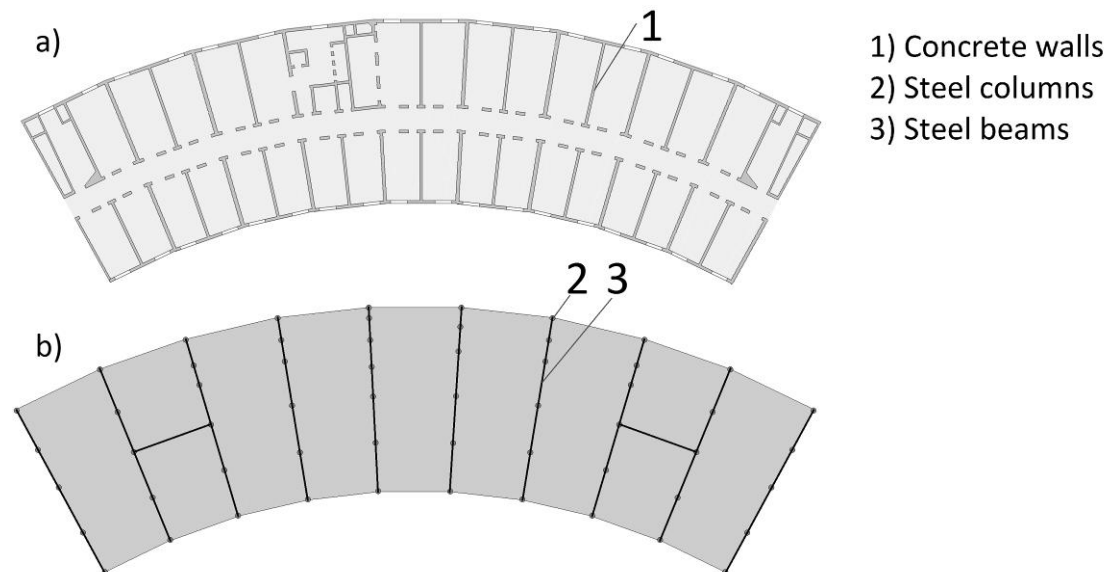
Plans in Scandic Opalen, a) storey in original building, b) storey in extension.
